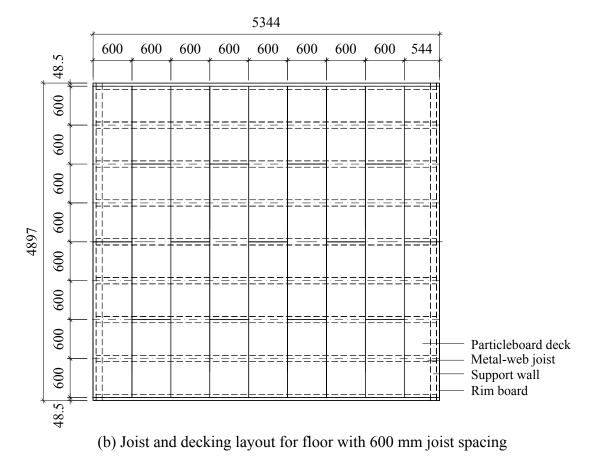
Layout of joist, deck and ceiling arrangements of metal-web joist floors
